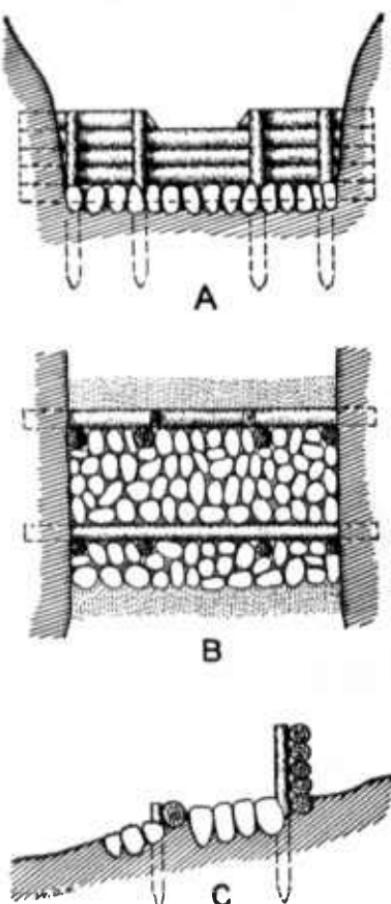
Dam built of logs and posts with splitway at center and stone pavement below the dam. A, Front view. B, Top view. C, Side view.
